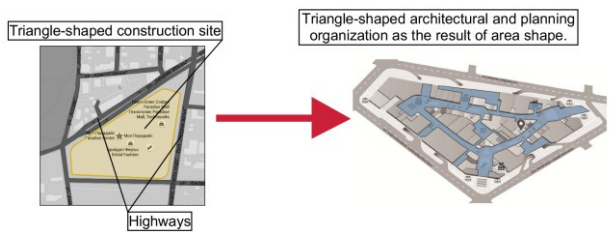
"Paradise" mall. Master plan [5] and first floor scheme [7]
